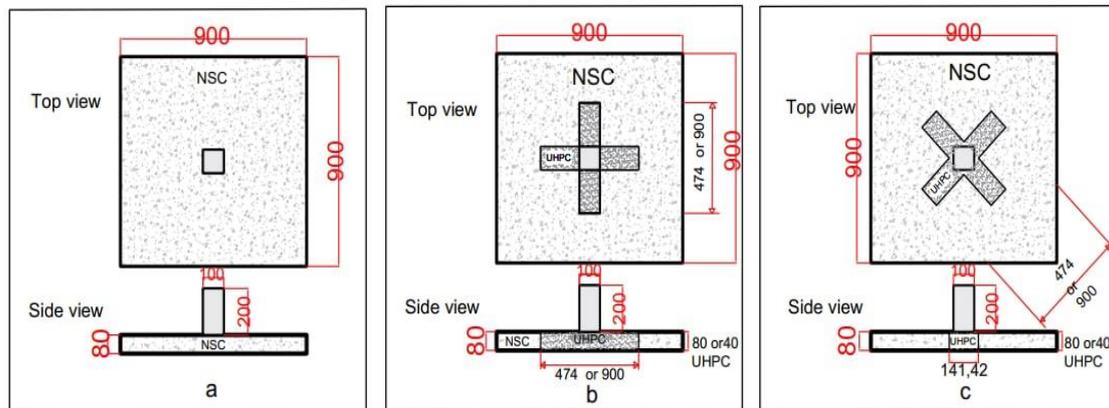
Specimen layout: (a) normal concrete NSC or Sh.R.N (b) hybrid concrete 187-PF or 400-PC (c) hybrid concrete 187-XF or 400-XC (Note: all dimensions in (mm))
